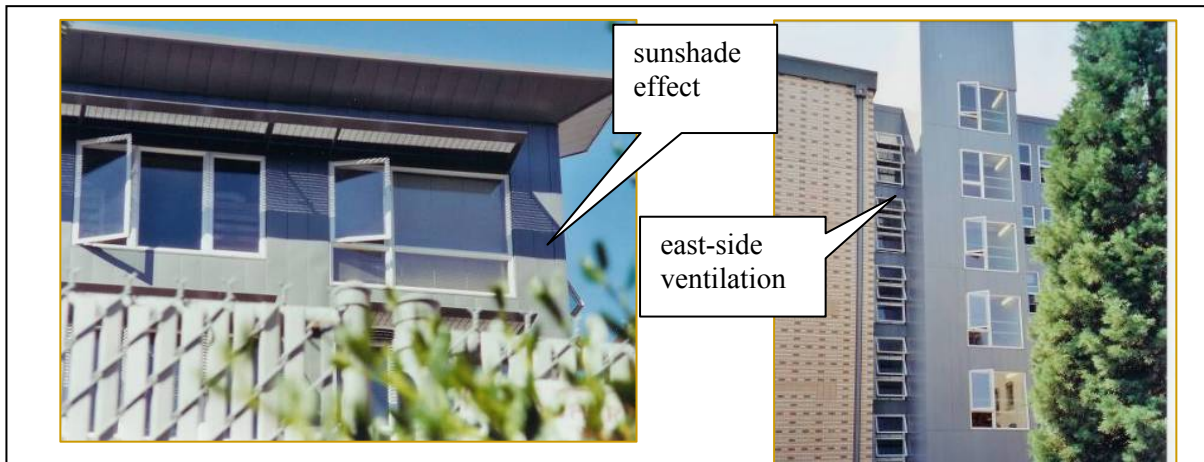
Epler south apartment windows and east ventilation shaft and stairway (7/ 2004)
